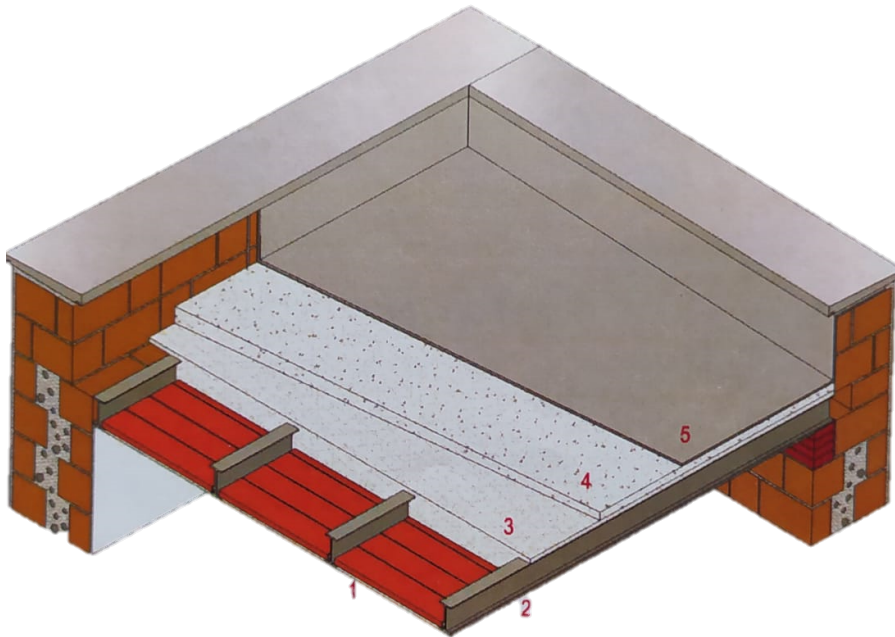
Iron slab: 1) brick tiles, 2) steel beams, 3) concrete screed, 4) slope screed, 5) waterproofing layer
